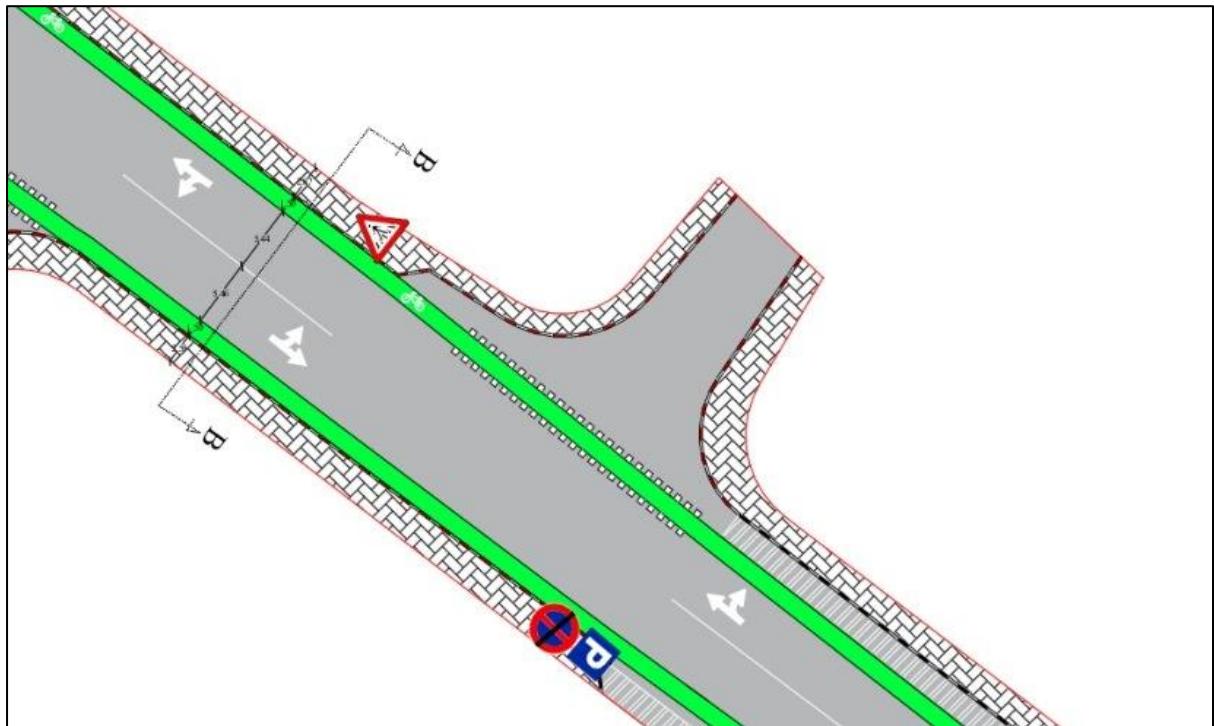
8: Plan Drawing Section B-B, Rafidia Street
